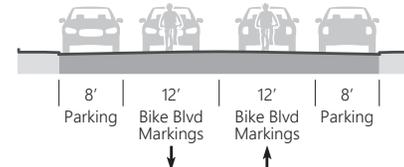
ZOE AVENUE EXISTING CROSS-SECTION
